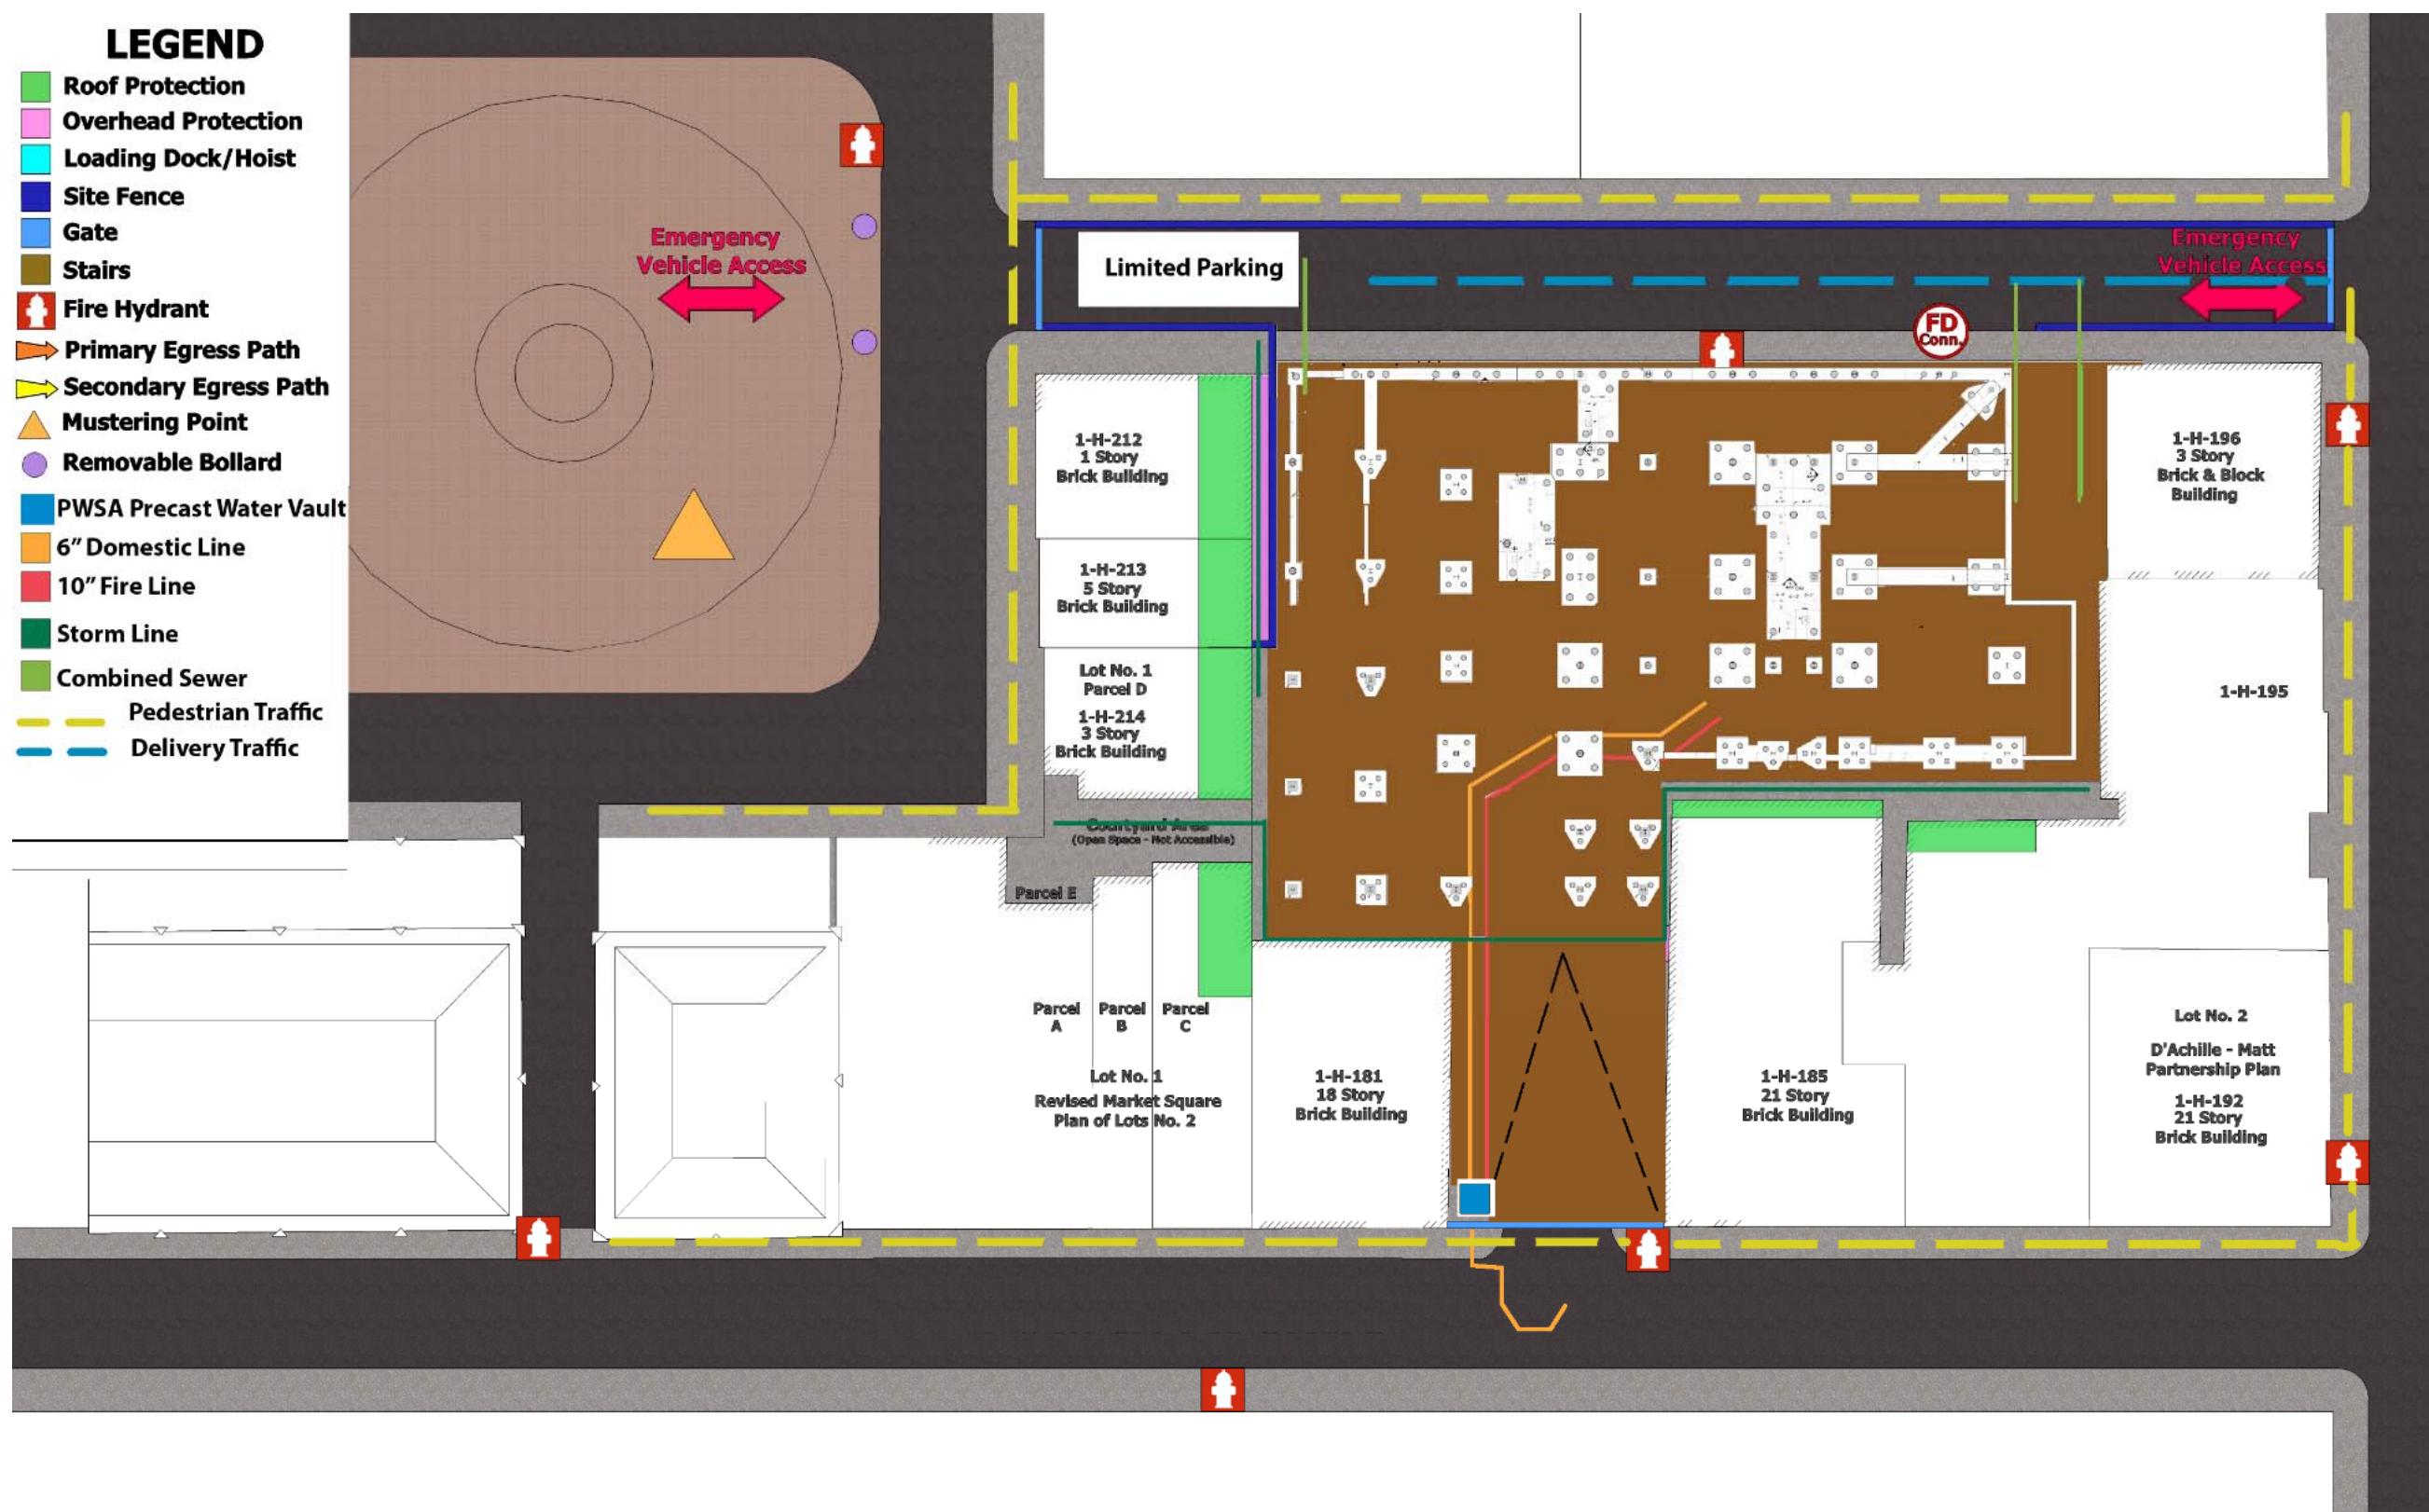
Pile Cap and Grade Beam Site Logistics Plan
